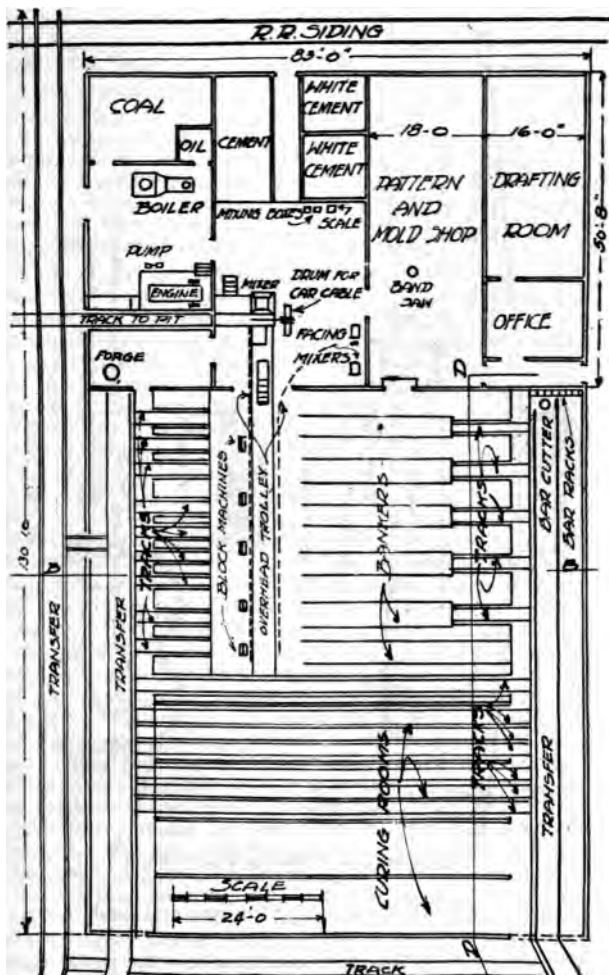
PLAN AND LAYOUT OF PLANT NO. 3
